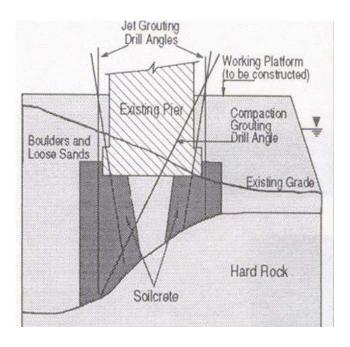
Cross section of jet grouting repair at the CSX Bridge
